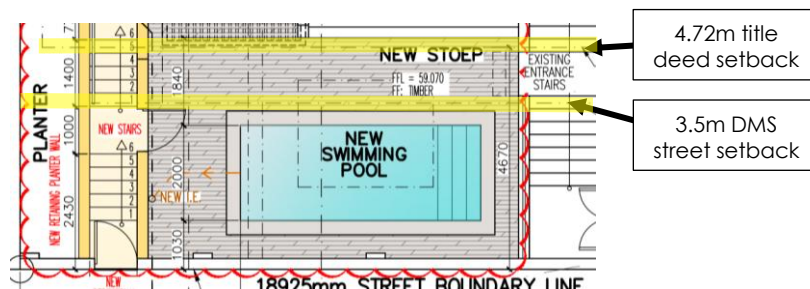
Extract from the 1st Storey Plan (new work in colour)
